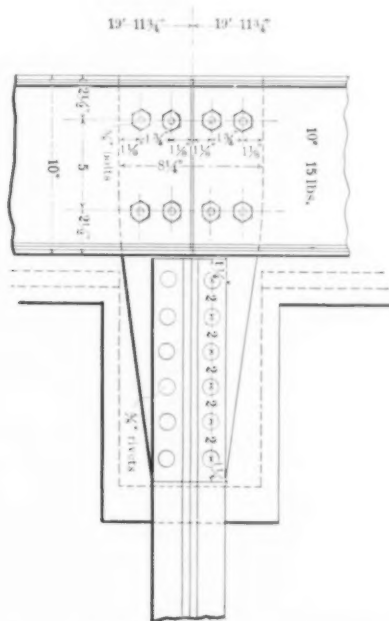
A.—DETAIL OF ROOF CONSTRUCTION PLAN.
